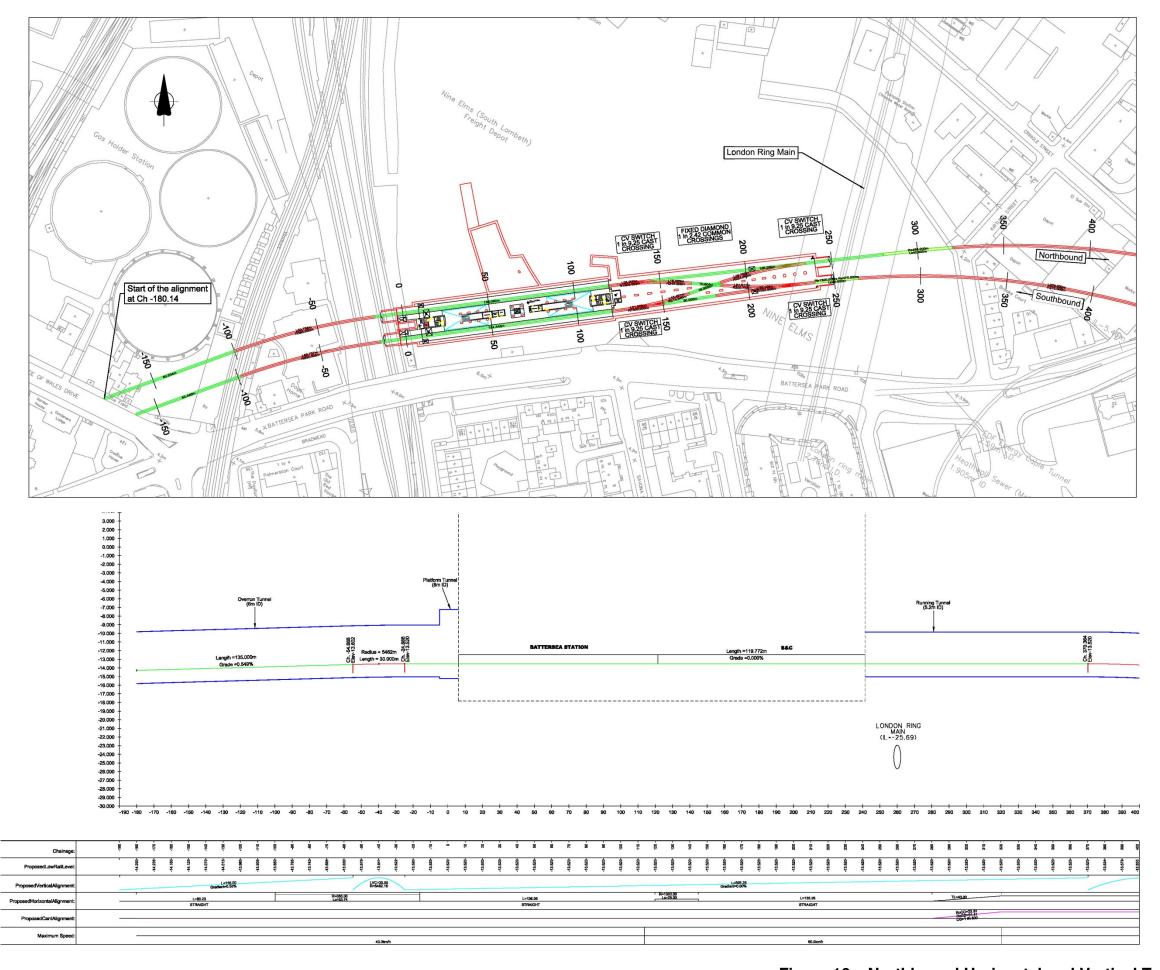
Northbound Horizontal and Vertical Track Alignment Sheet 1
